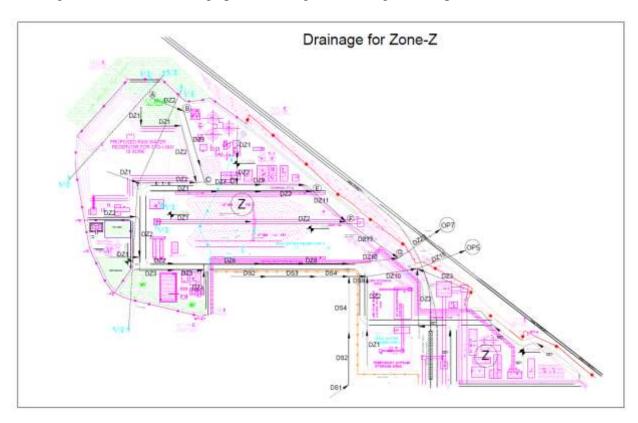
Z Zone drainage plan showing drains, longest flow path and outfall location
